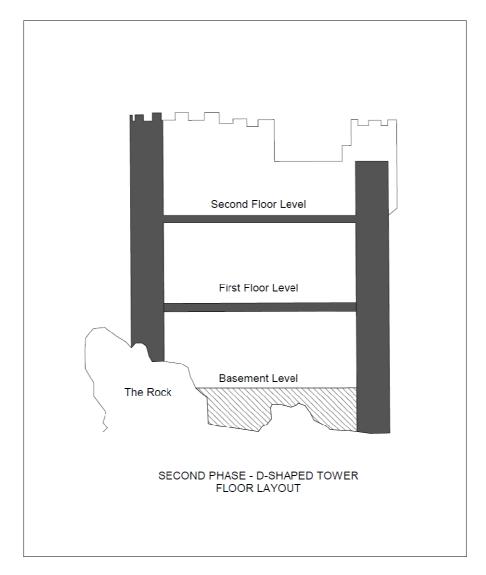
Floor Layout of D-Shaped Tower *c.* 1200, north to south section
